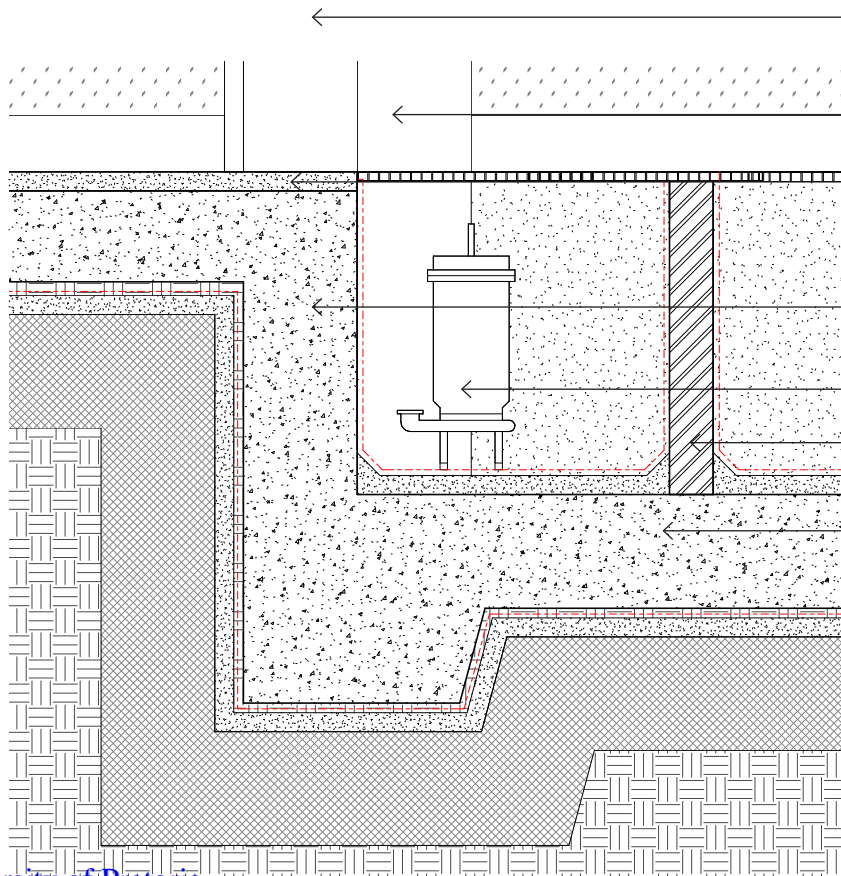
Detail of production space service channel (Drawing at 1:20) (Original drawing at 1:10) (Author:2018) (Detail influenced by Raubenheimer (2014) and Nieuwoudt (2011))
